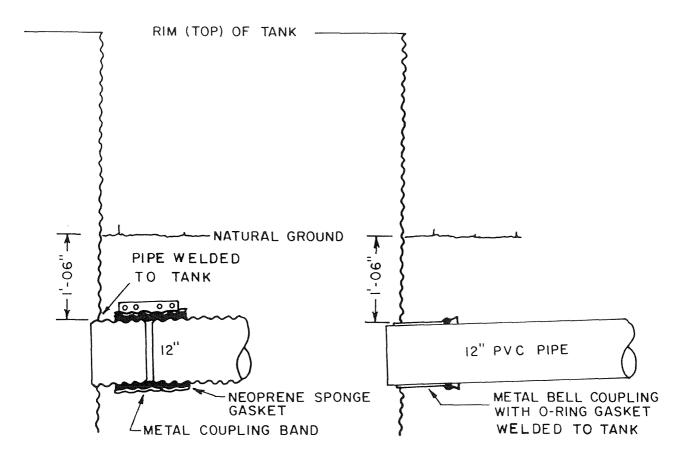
Details of connecting buried conveyance pipe into side of storage tank. Finished pipeline from catchment to storage tank must be water tight.
